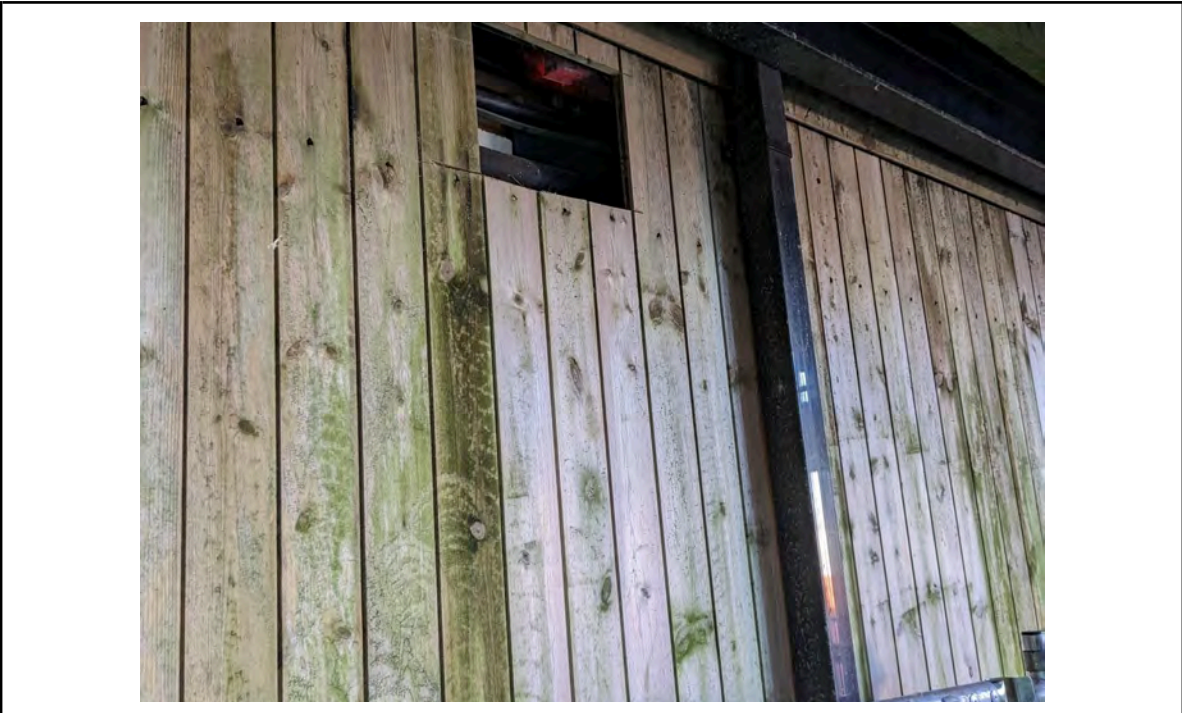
Location 25 - timber cladding removed on 3rd floor at inner courtyard elevation
